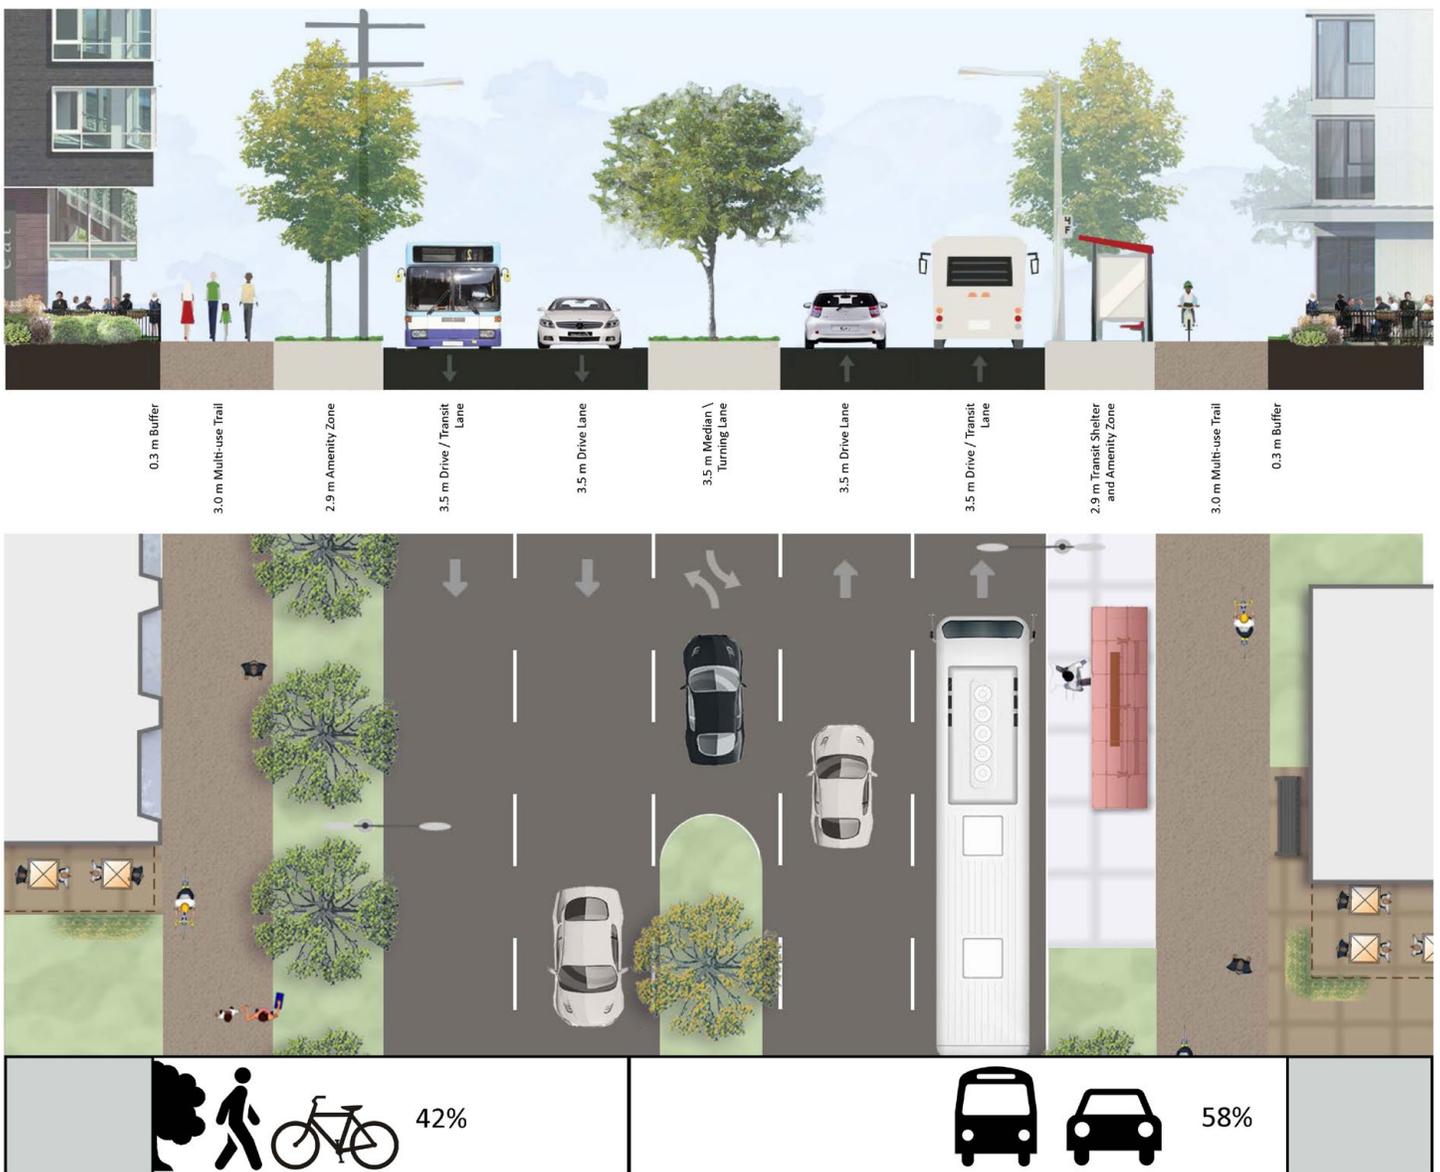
Example Streetscape Section and Plan for 30 metre ROW
